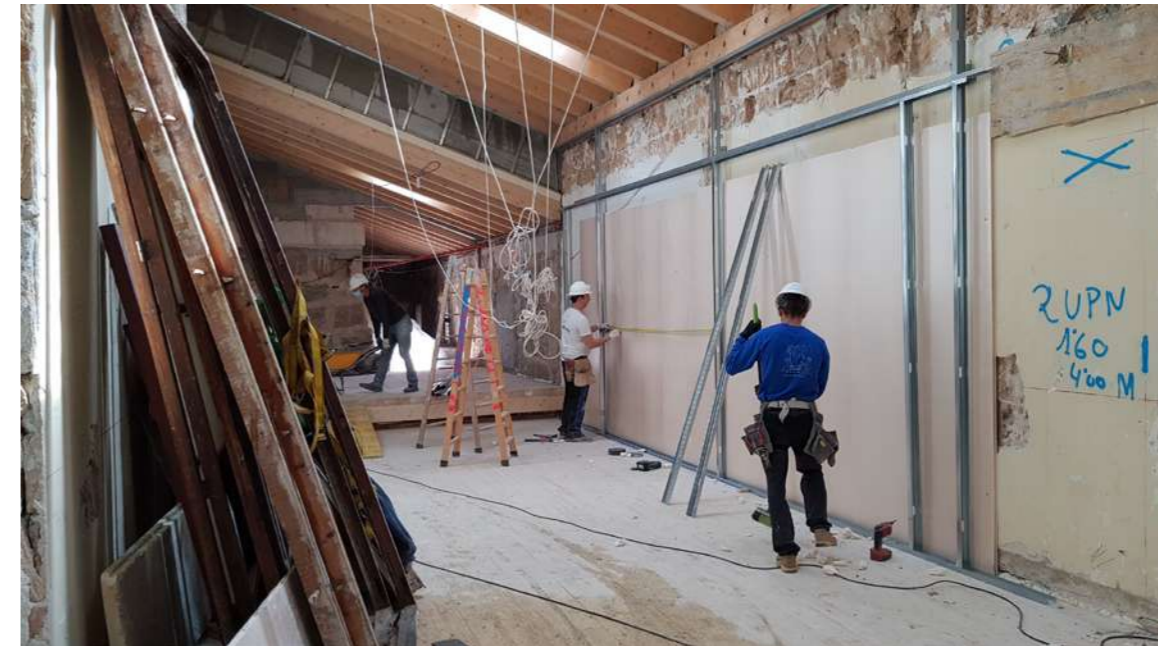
Thermal insulation on the inside layer of the original marés stone walls.
